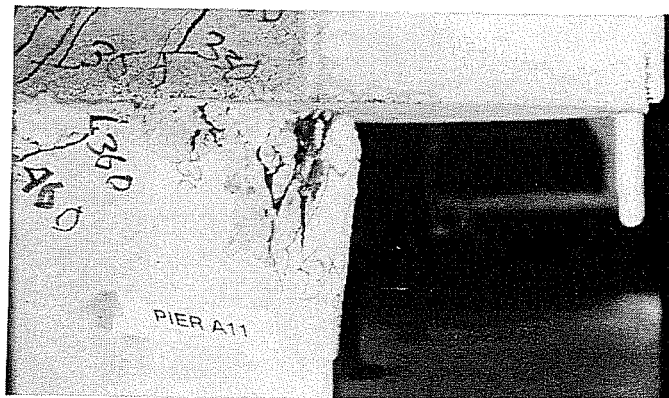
Crushing of Pier A1-1 After Failure
